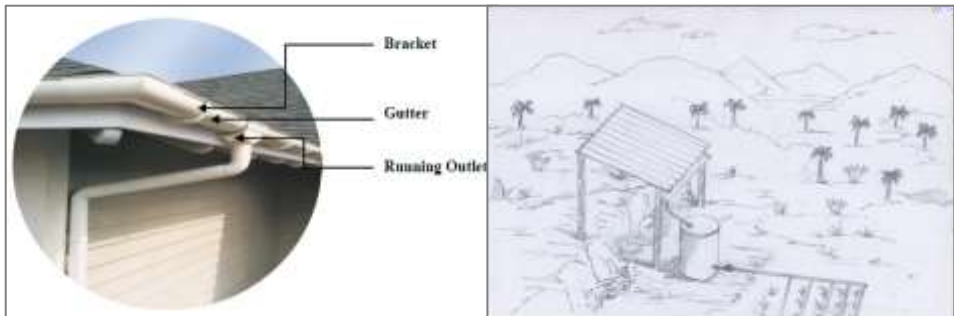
Rooftop RWH system (Source: FAO, 2014)
